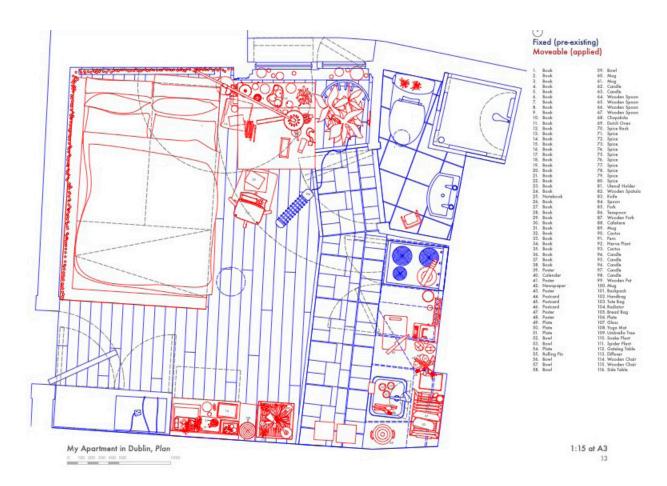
My Apartment in Dublin, Plan. Lily O'Donnell.
